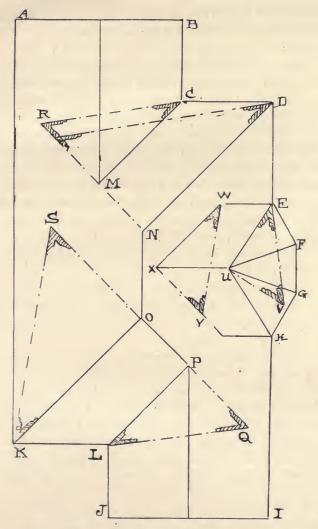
PLAN AND LAYOUT OF ROOF.
